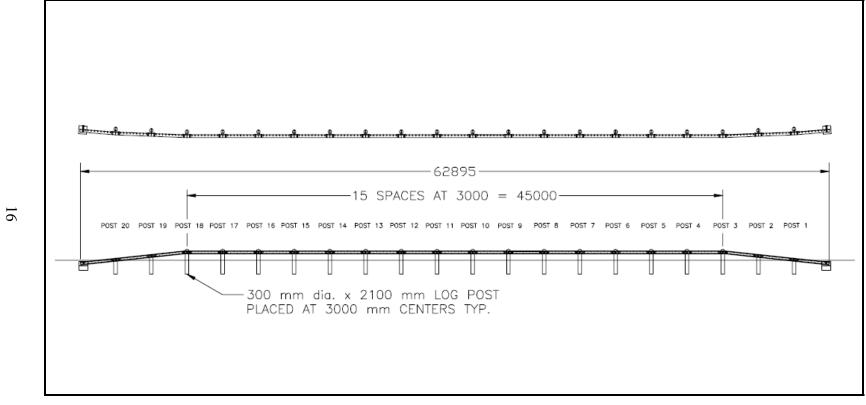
Layout of Steel-Backed Timber Round Log Rail
